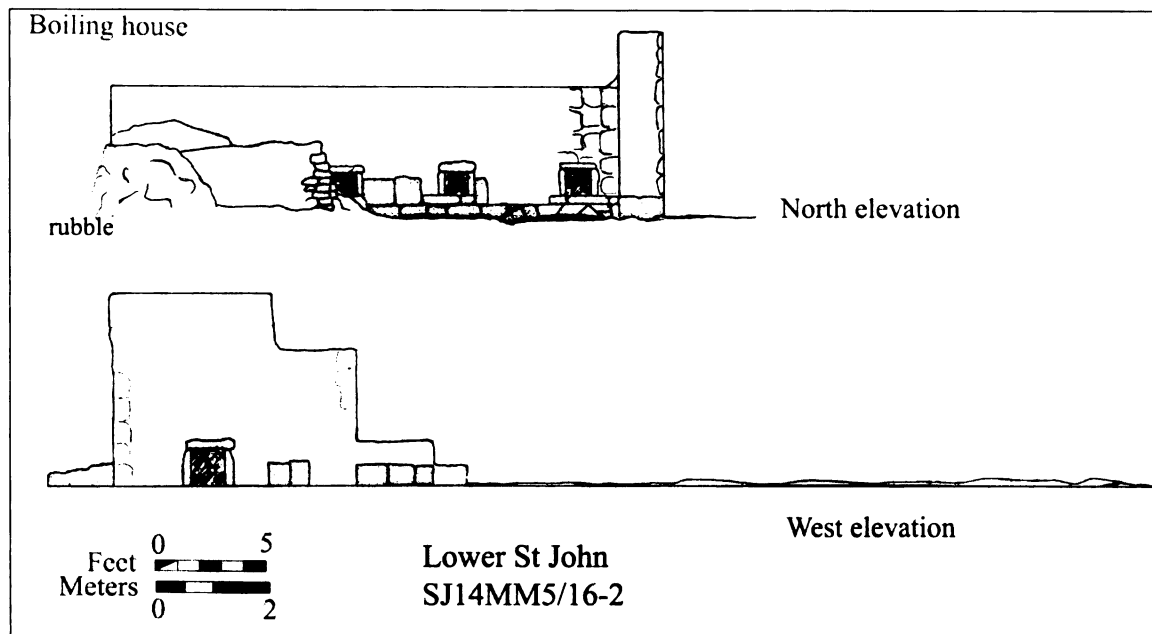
North and west elevations of boiling house, and adjacent foundations of Lower St. John site. Nearly all of the dressed stone has been removed. The structure most likely supported a hipped roof covered in tile. The boiling house could get very hot with fires below and sugar juice boiling.
